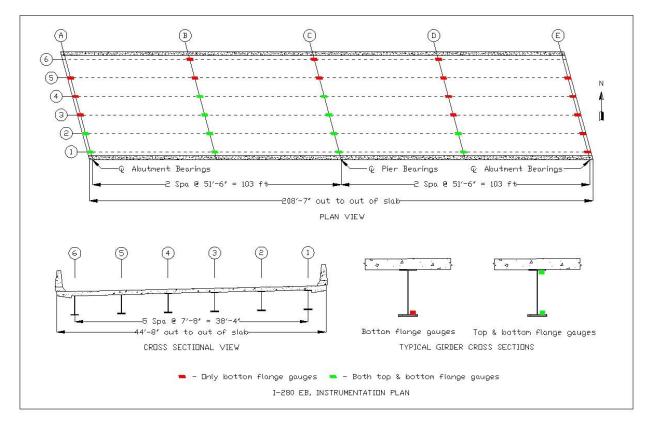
Instrumentation layout plan for girder gauges on I-280 EB Bridge over US 67 near Milan, Illinois
